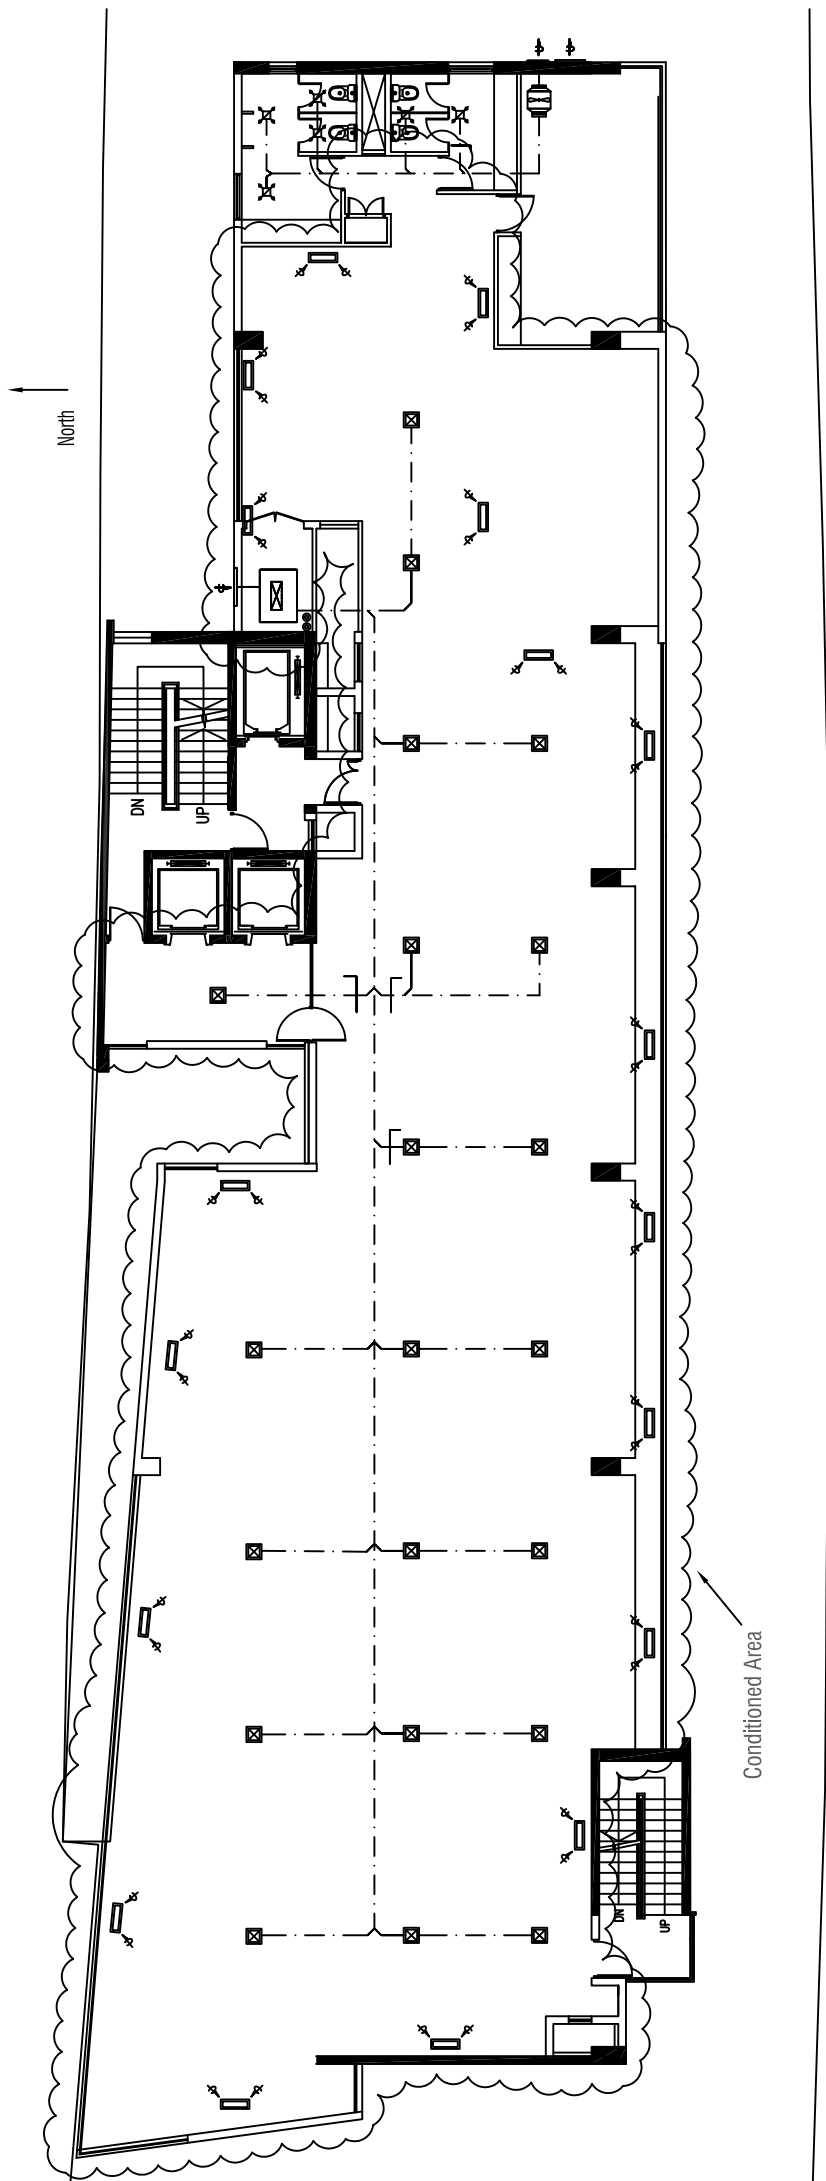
Peoples Leasing Building – 5 to 9 Typical Floor
